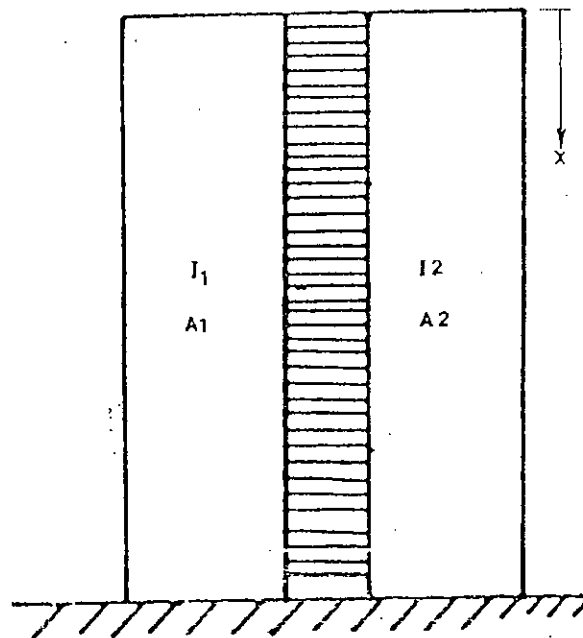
Shear wall with idealized continuous connection of laminae.
